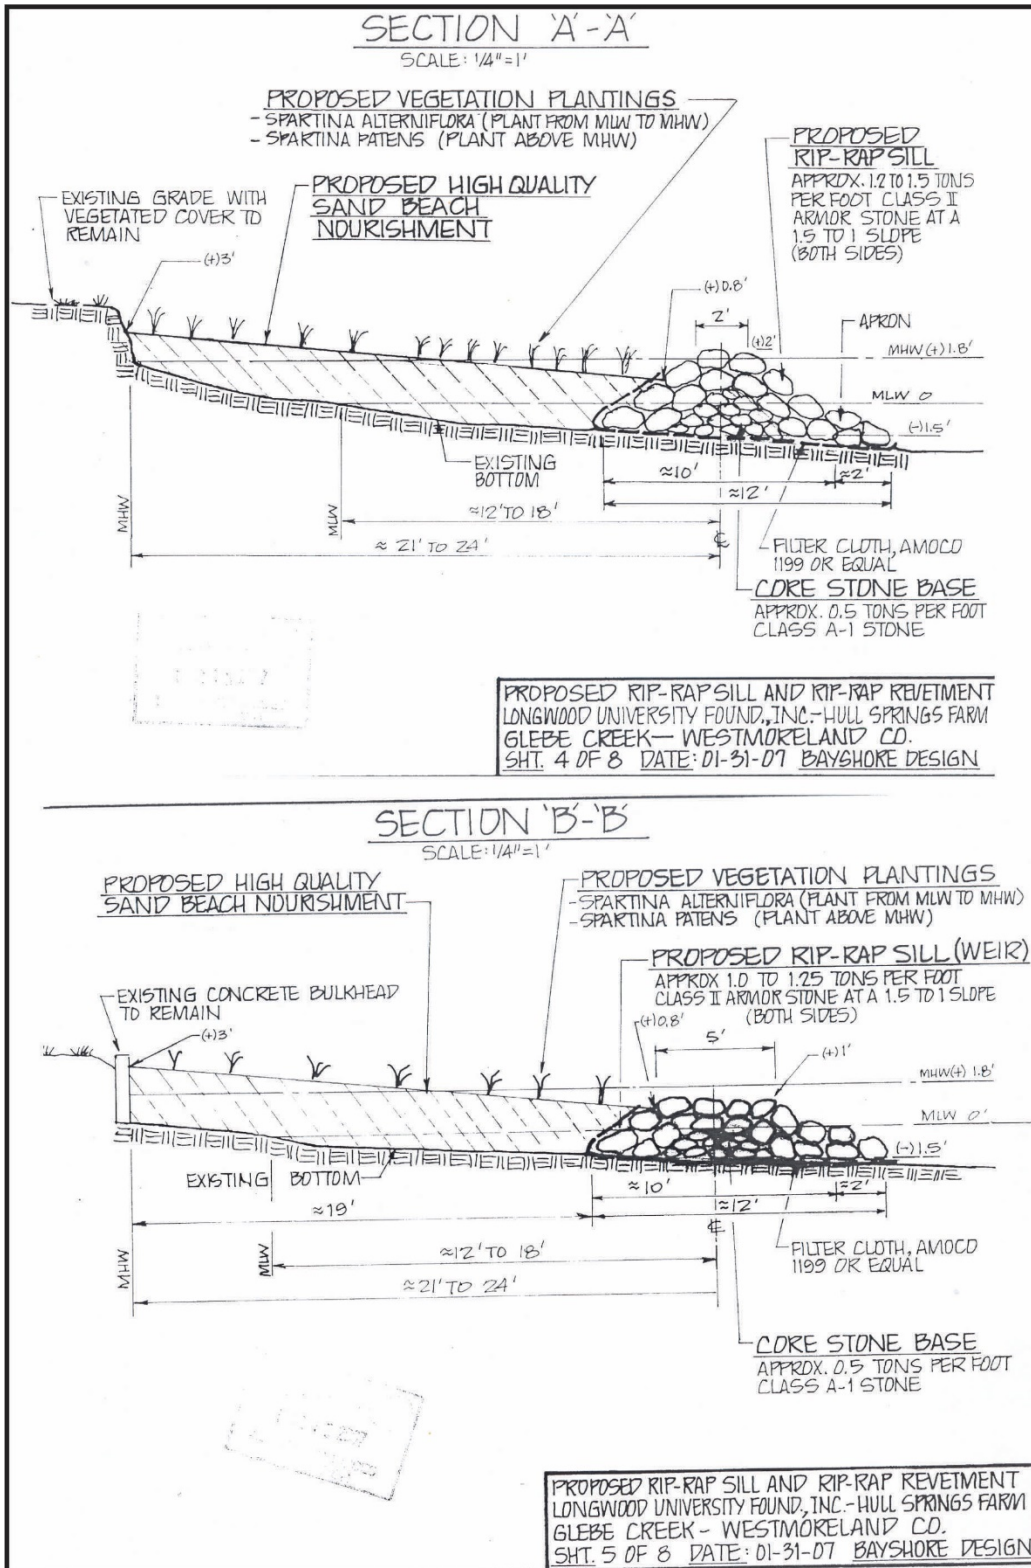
Typical cross-sections AA and BB for the living shoreline project at Hull Springs Farm. AA is the westernmost section. BB shows the sill along with the existing concrete bulkhead. Cross-sections courtesy of Bayshore Design.
